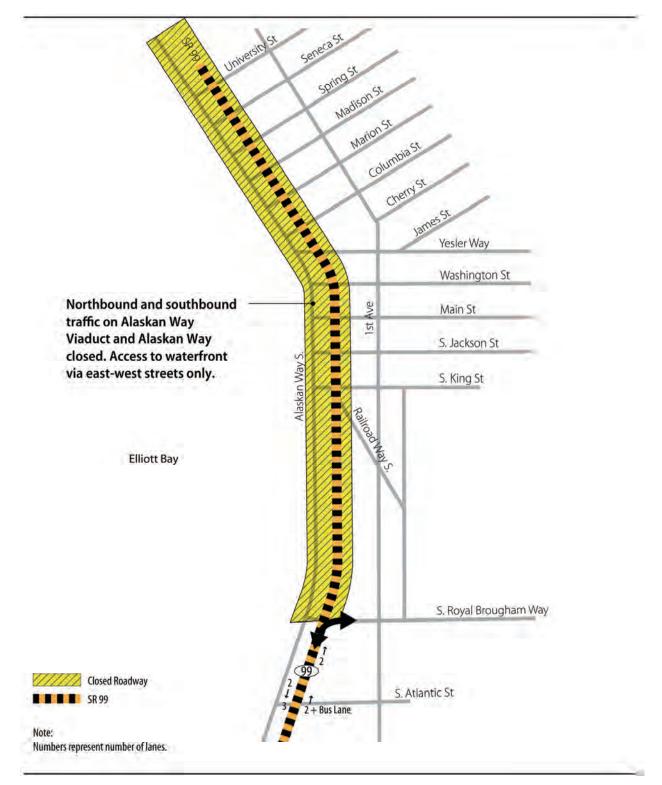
Cut-and-Cover Tunnel Alternative Traffic Stage 4 Roadway Configuration (South)
